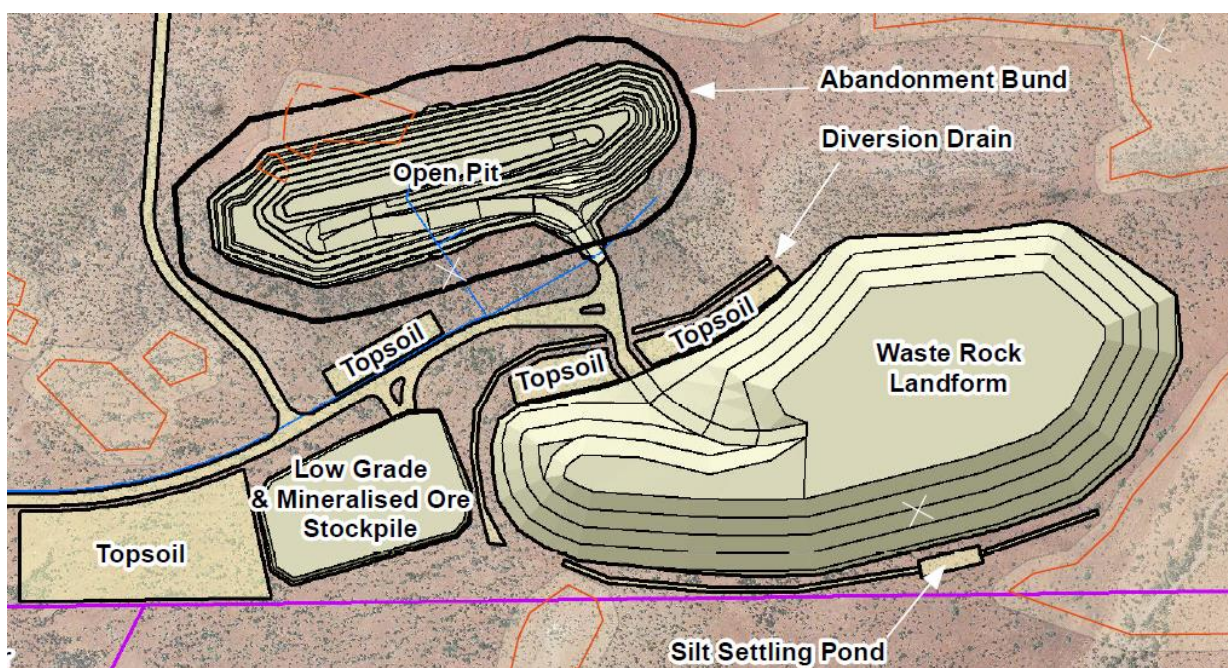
Beebyn-W11 Waste Rock Landform Layout
